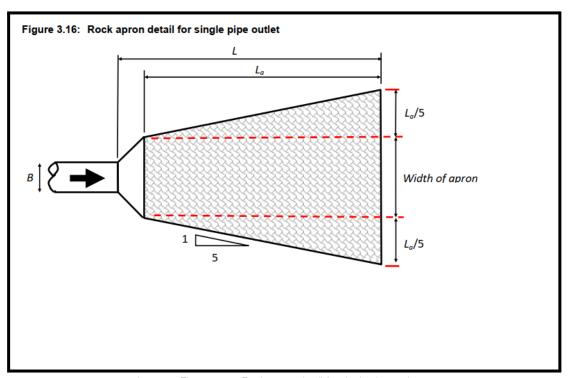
Figure 3.16 - Rock apron detail for single pipe outlet.
